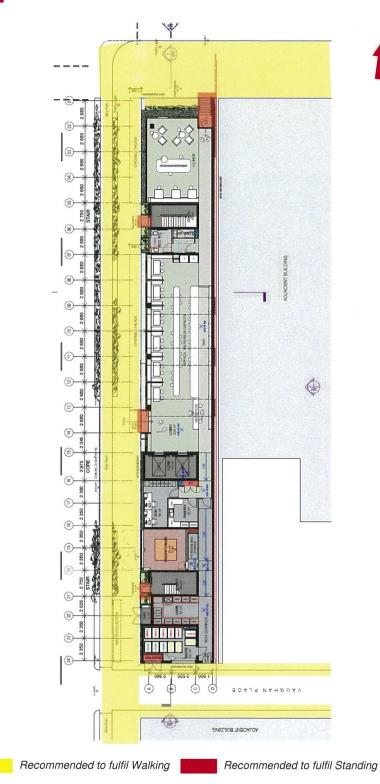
Ground level Plan view of the proposed development with recommended wind criteria overlaid
